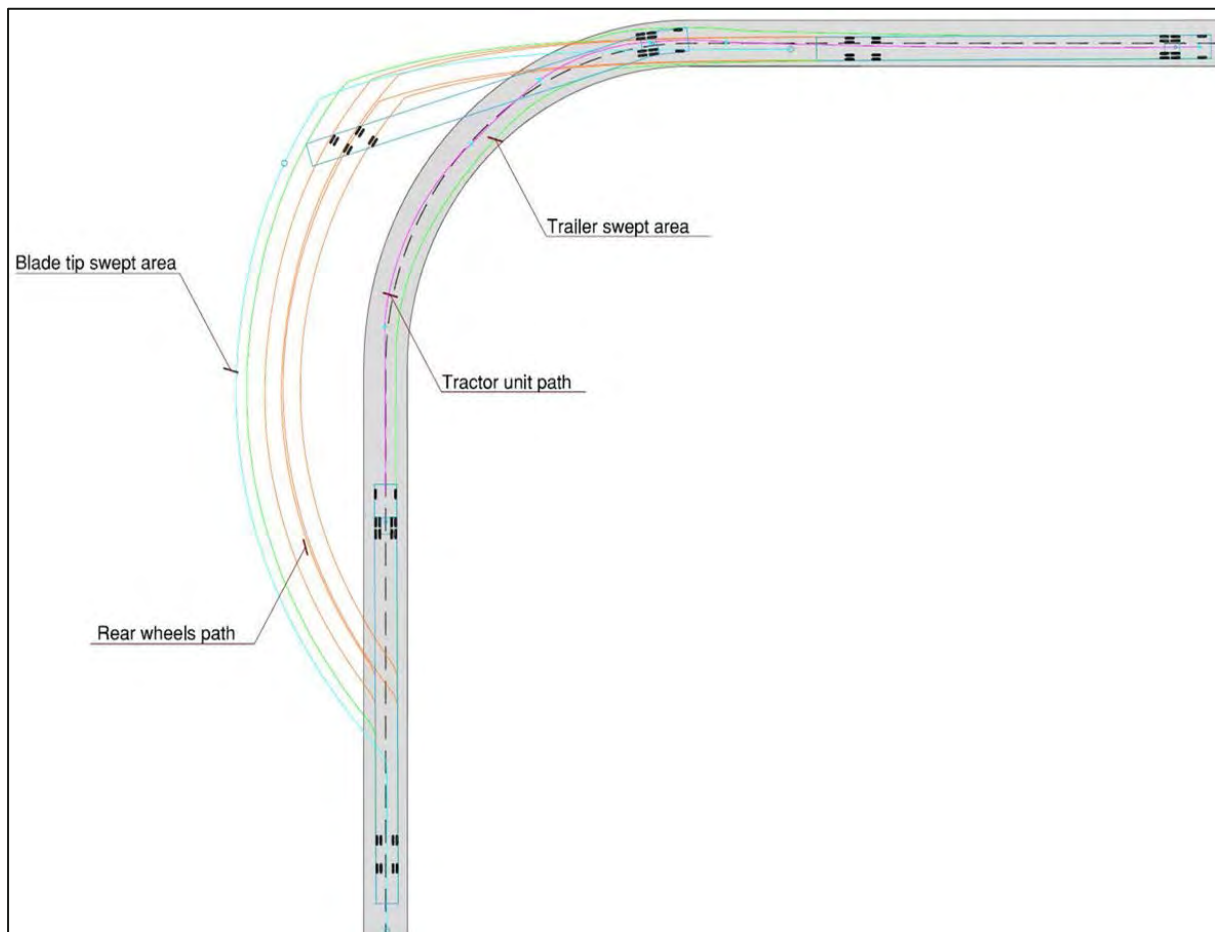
Swept path of blade transport vehicle with steerable rear wheel axles for low load trailer showing outside bend only
